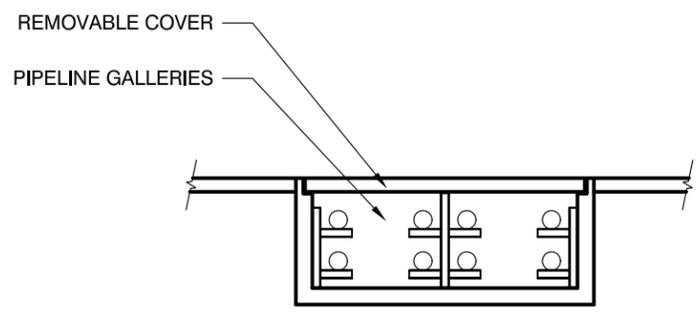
CONCEPTUAL DESIGN - ALTERNATIVE C - DETAIL SECTIONS
